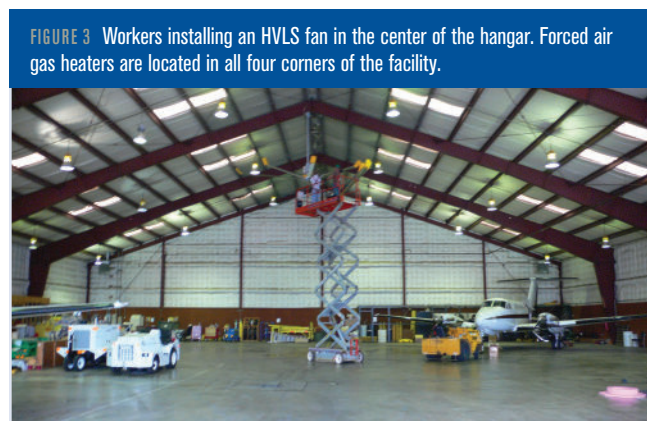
Workers installing an HVLS fan in the center of the hangar. Forced air gas heaters are located in all four corners of the facility.
